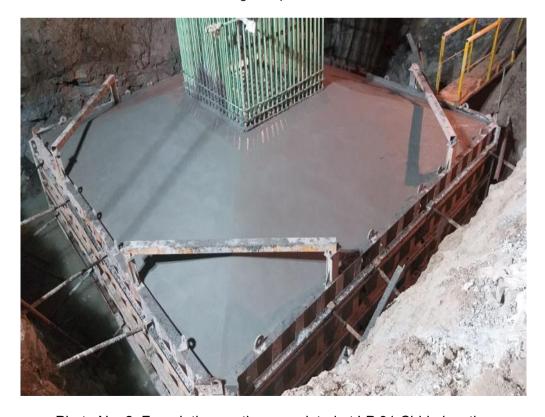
Foundation casting completed at LP 31 Chirle location
